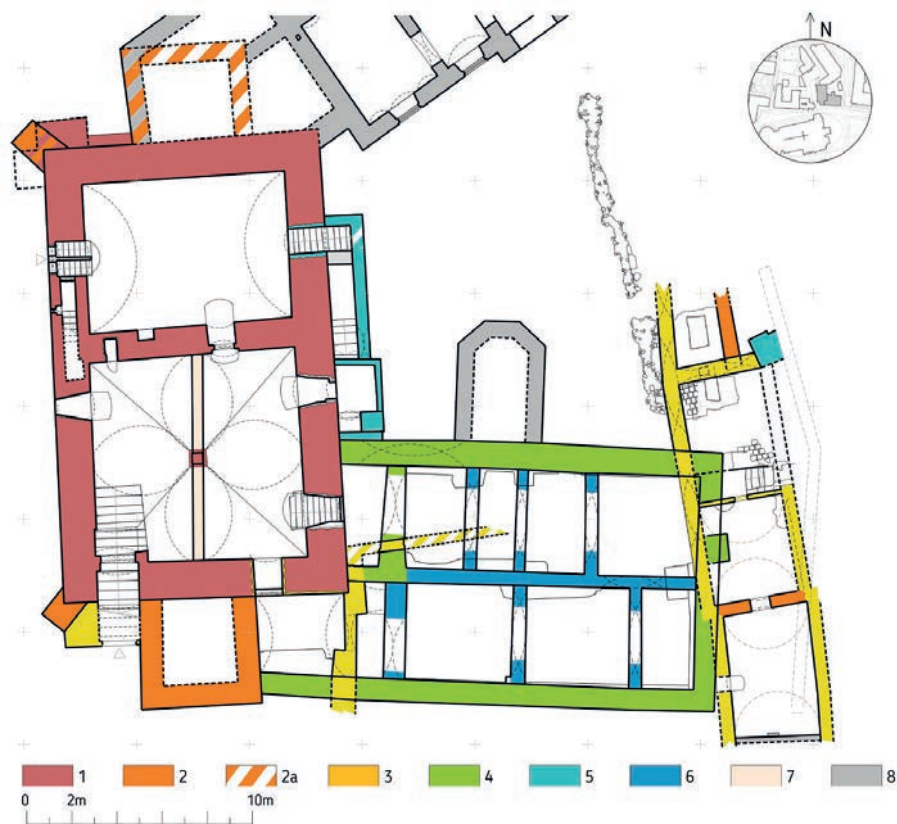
Layout of the cellars of the Chapter House, the Office and the adjacent utility buildings. 1 – walls from the second half of the 14th century, 2 – walls from the second half of the 15th century, 3 – walls from 1518–1527, 4 – walls from ca. mid-17th century, 5 – walls from the second half of the 17th century–the 18th century, 6 – walls from 1756, 7 – walls from ca. mid-19th century, 8 – walls from 1882–1903 (developed by M. Bogdała and M. Chorowska)
